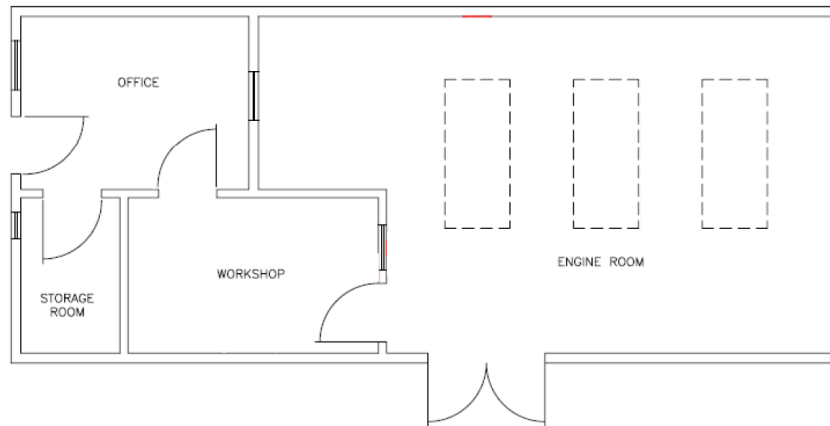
Paradise River Original Floor Layout (Extension Not Shown)
